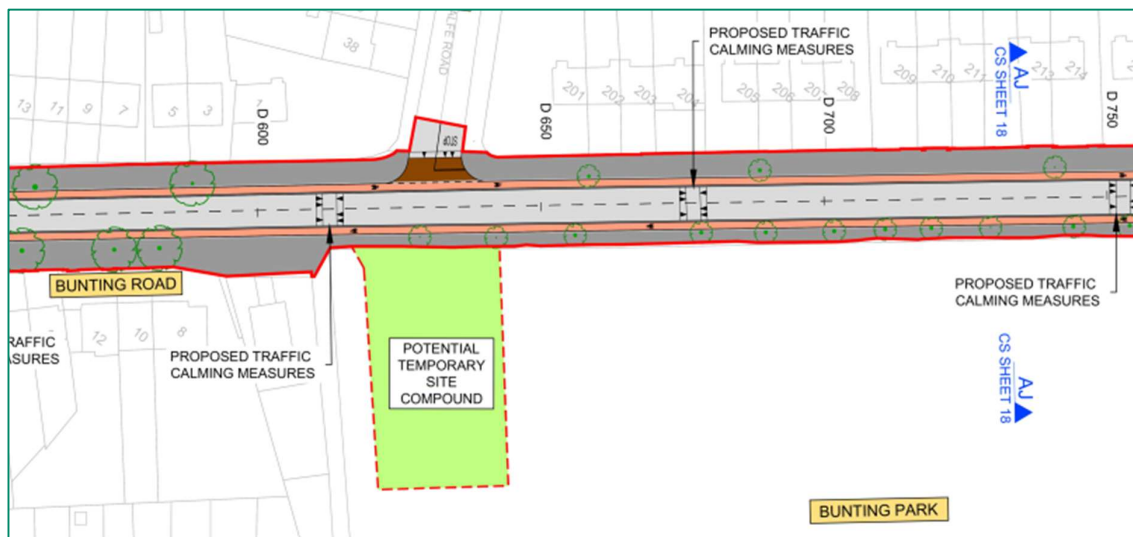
Extract of General Arrangement Drawings at Bunting Road
